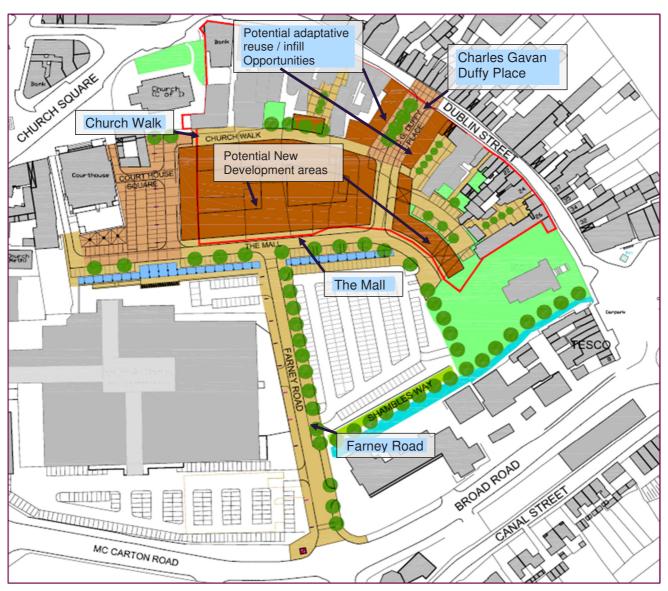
Dublin Street Regeneration Scheme Concept Layout
